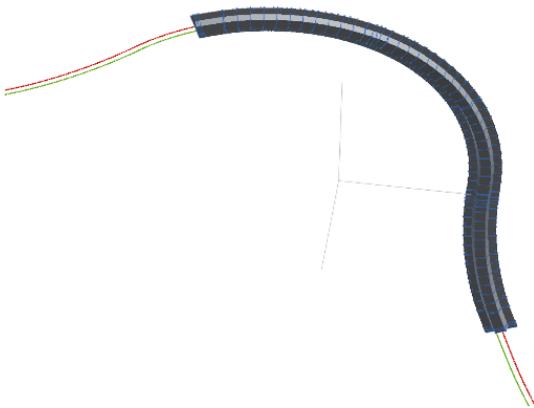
Gewan Island bridge 3D modelling, with plan radius of less than 125m
